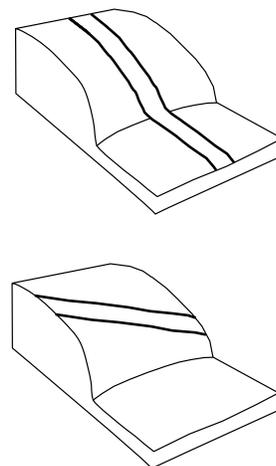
Parallel-Slope (above) and Cross-Slope (below) roads.
